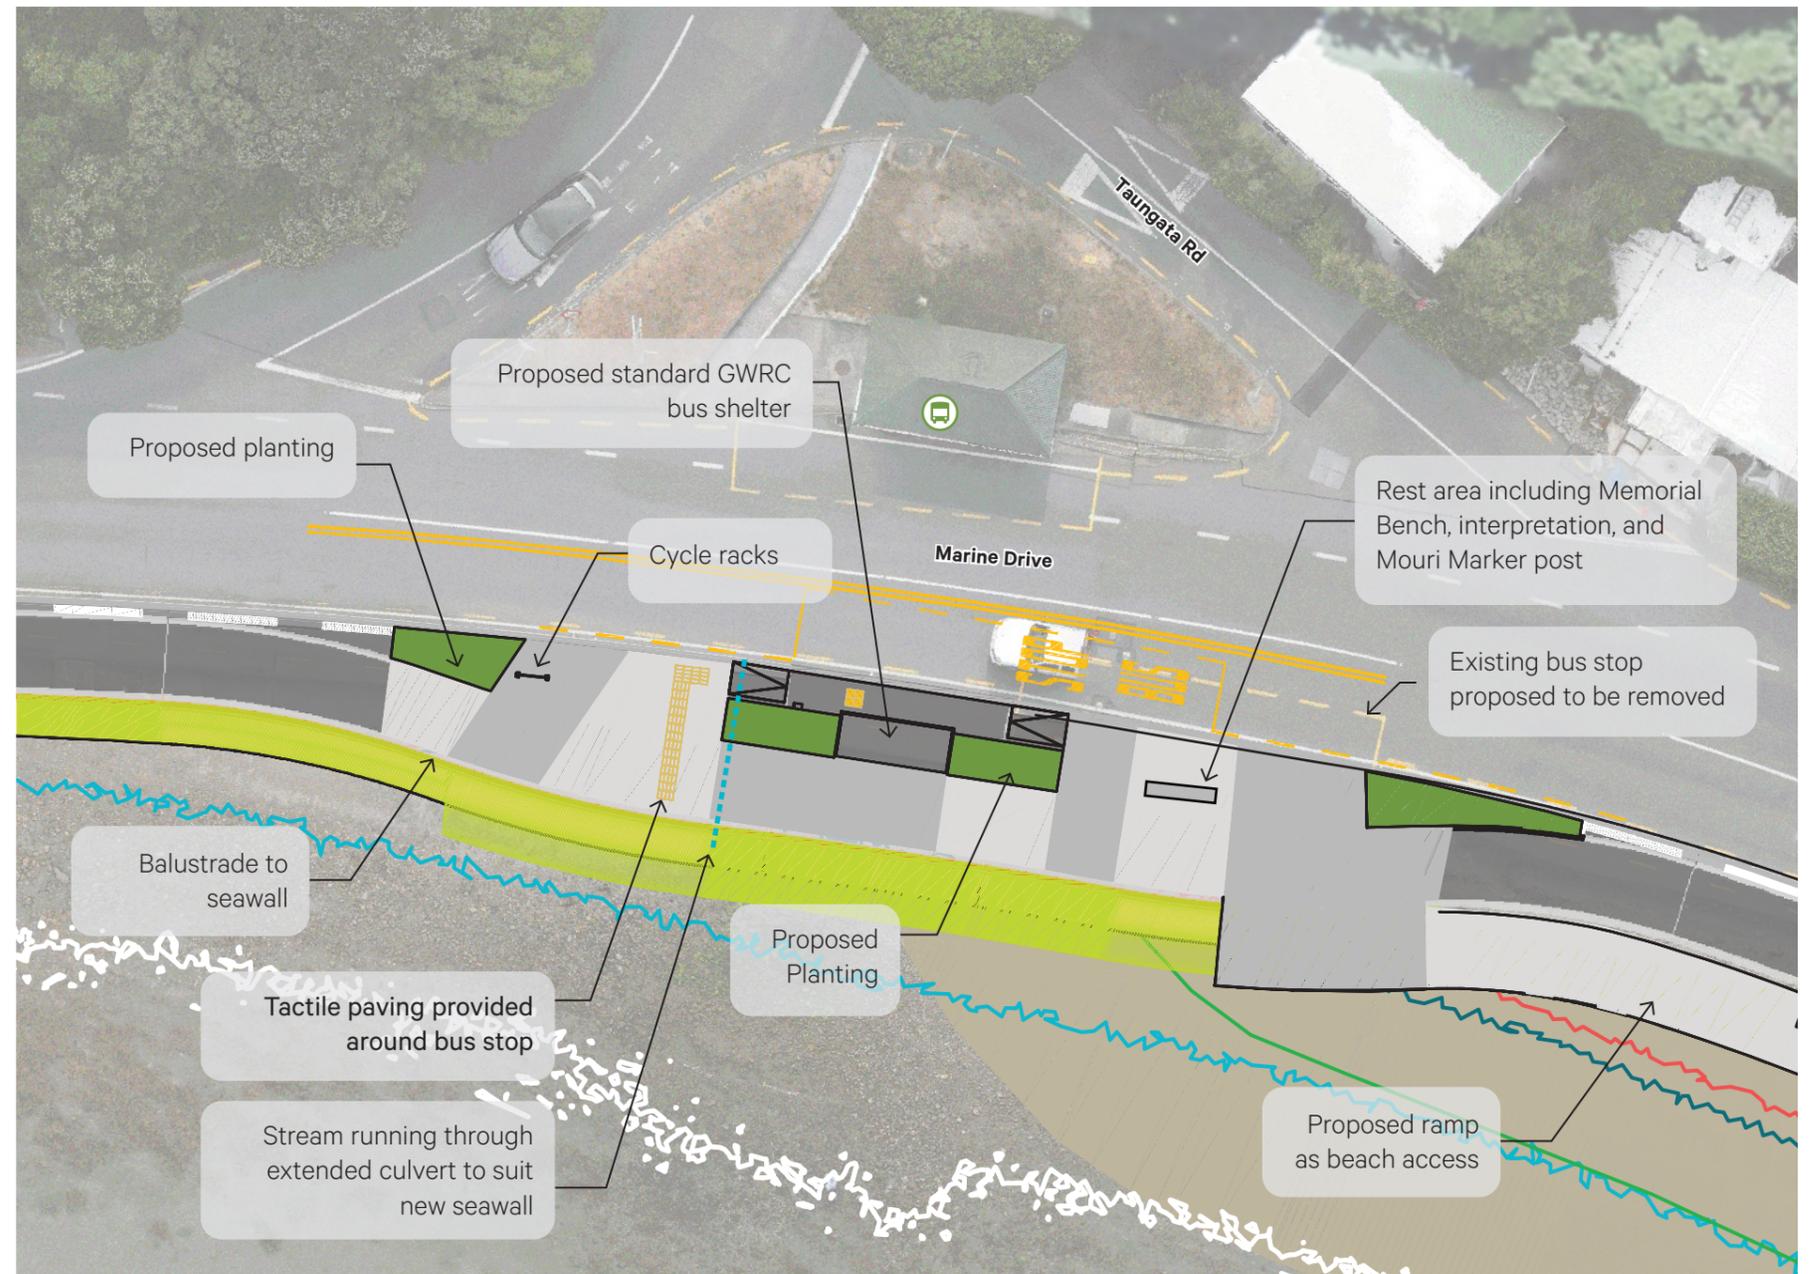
Proposed openspace arrangement at York Bay bus stop.
